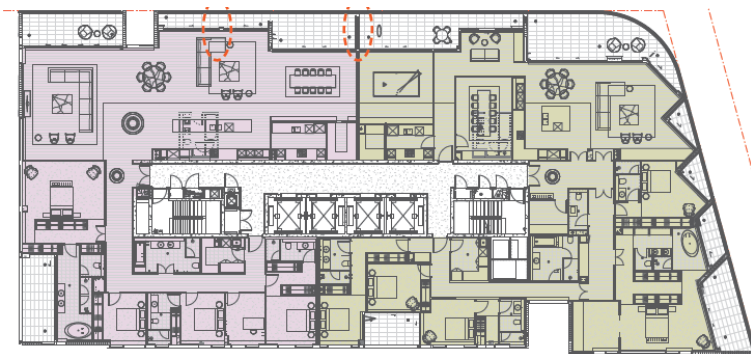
Proposed Level 34-37 study changes and façade amendments
